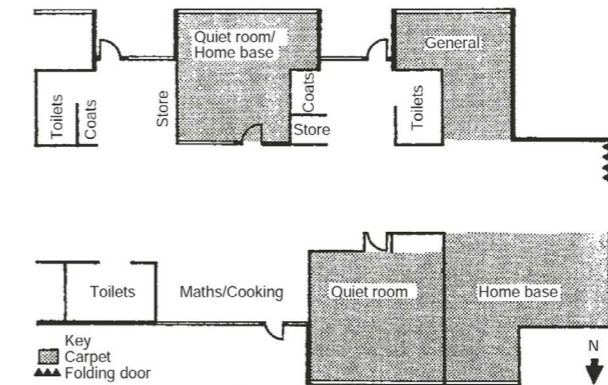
Typical open-plan classroom showing quiet rooms
